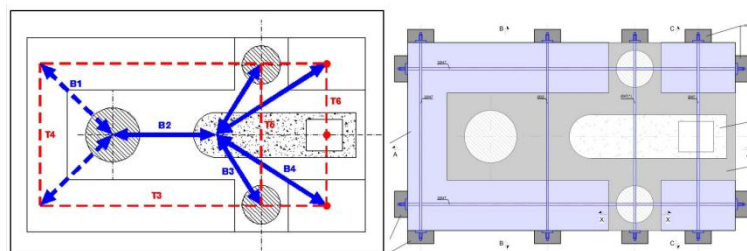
Plan view of the reinforced abutment equilibrium scheme (i) and extension and connection with prestressed bars of the abutment
